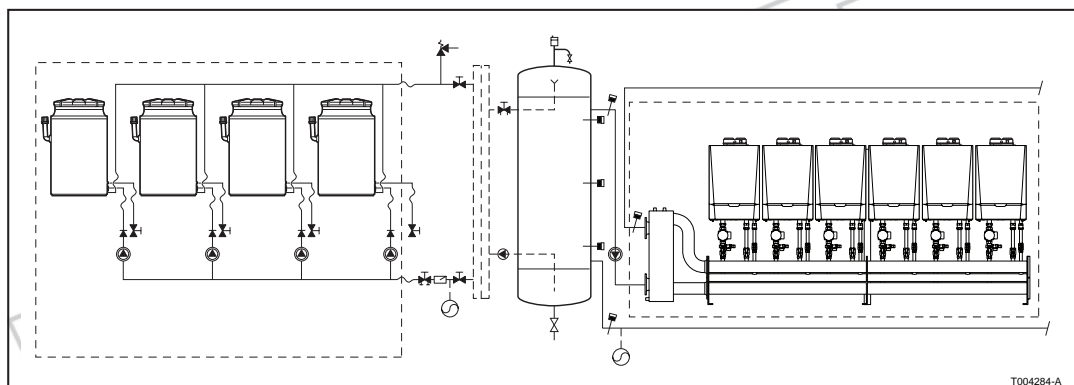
Hydraulic diagram with Quinta Pro boilers
